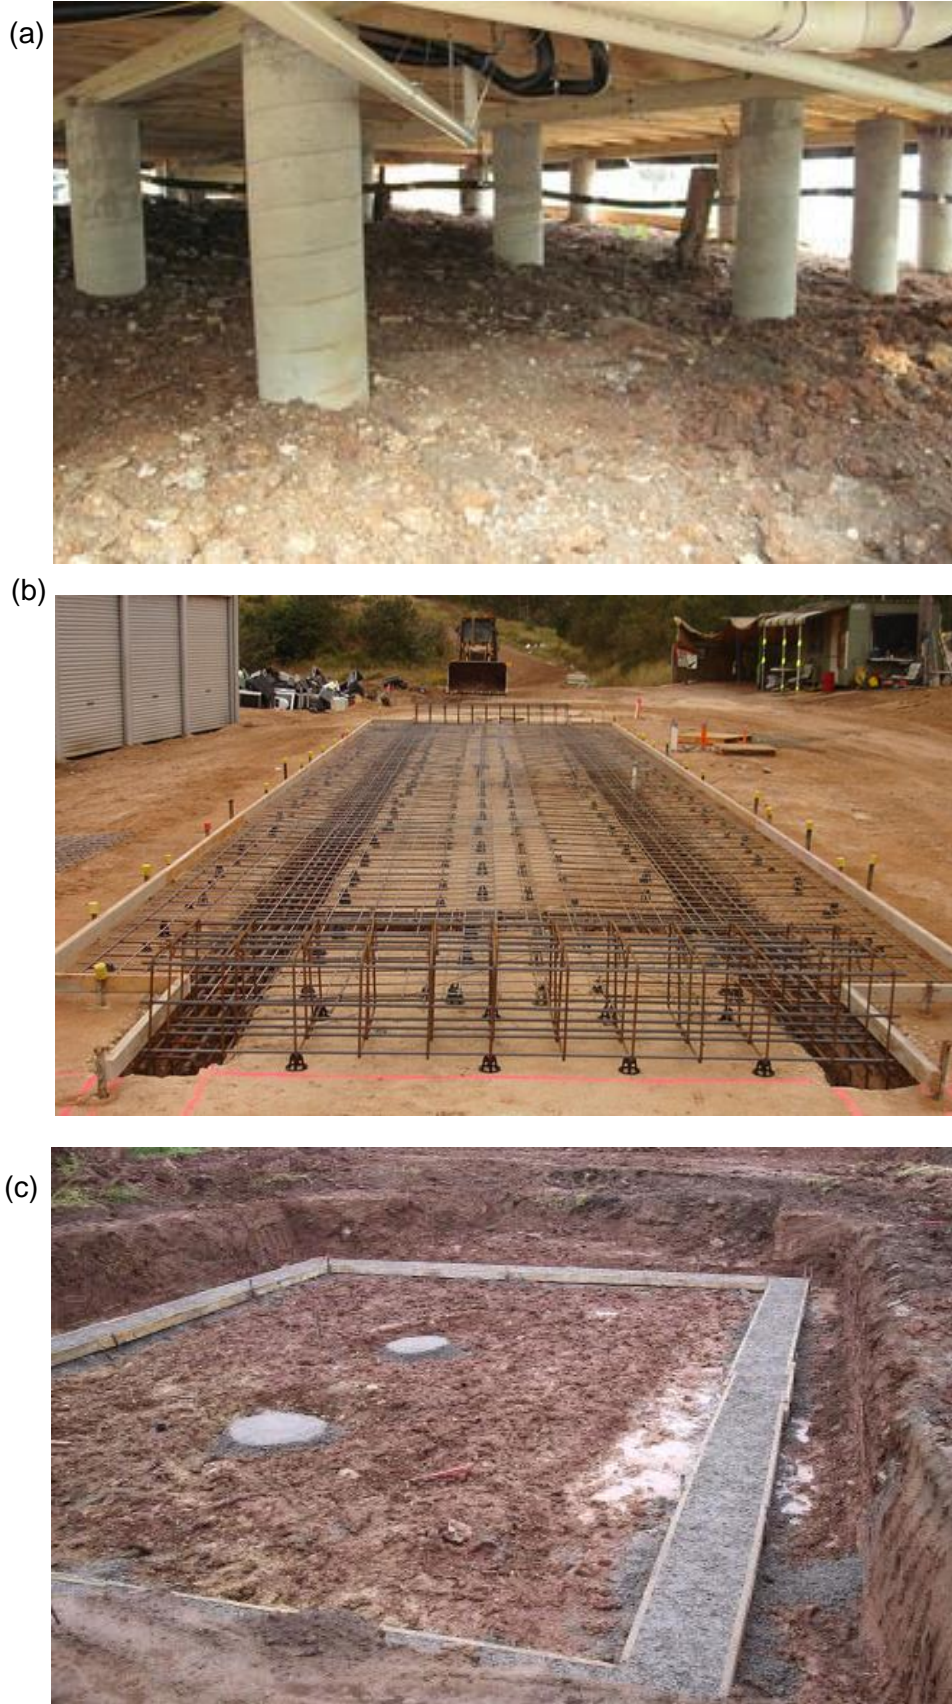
Different foundation types used on expansive soils: (a) pier and beam foundation, (b) stiffened raft foundation, and (c) continuous perimeter footing foundation.
